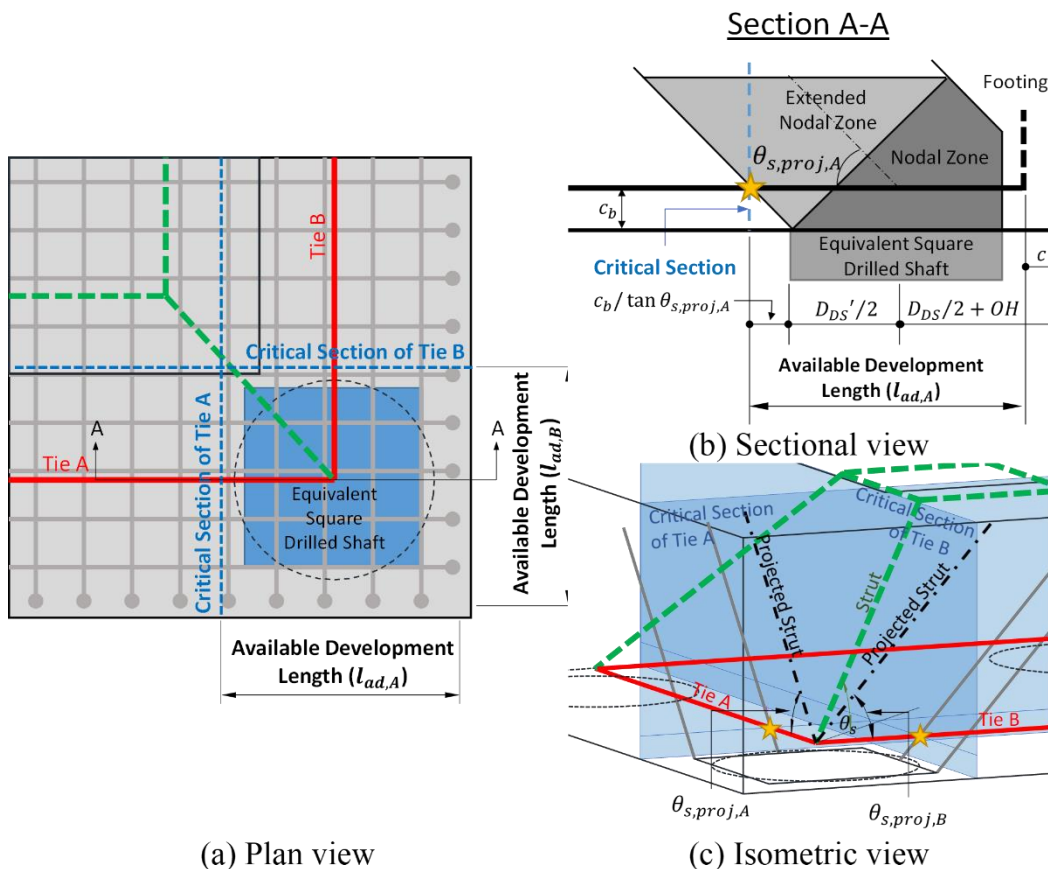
Proposed available length for anchorage of bottom mat reinforcement in drilled shaft footings
